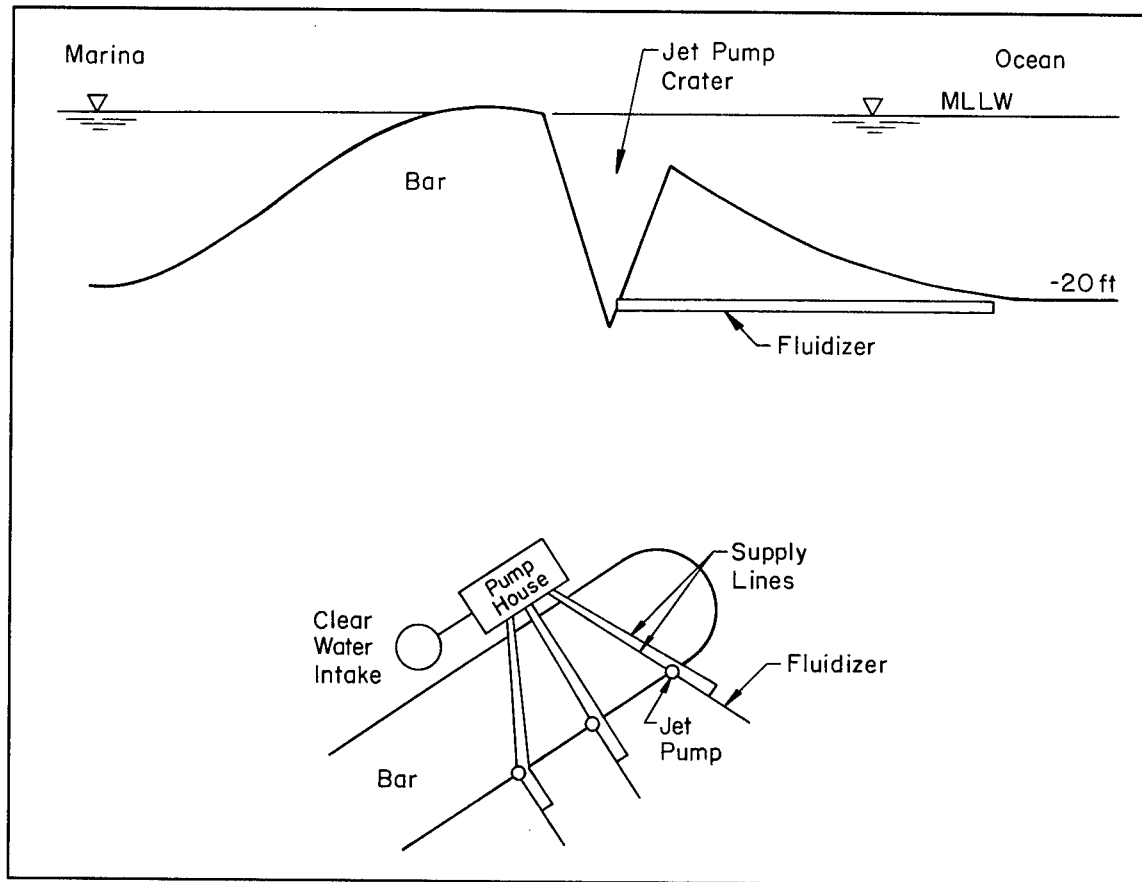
Section and plan views showing relative location of jet pump crater and fluidizer pipes, sandbar, pump house, and clear water intake
